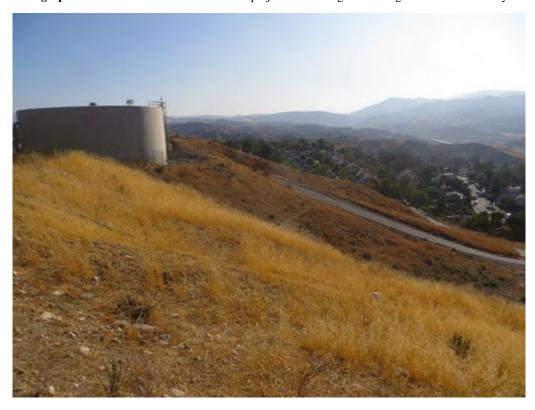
From the northwest corner of the project site looking east along the northern boundary.
